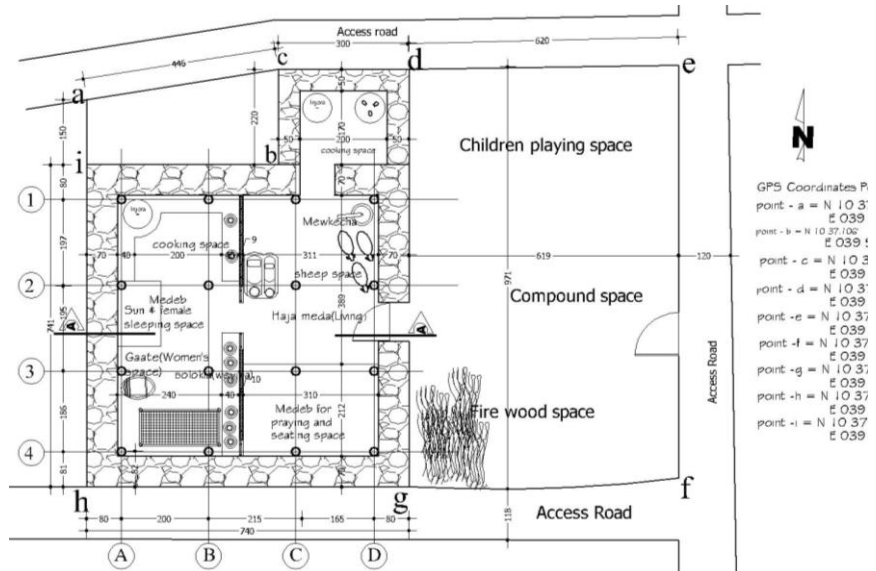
202 Compound and floor plan of Ato Mehamud Mohamed house
